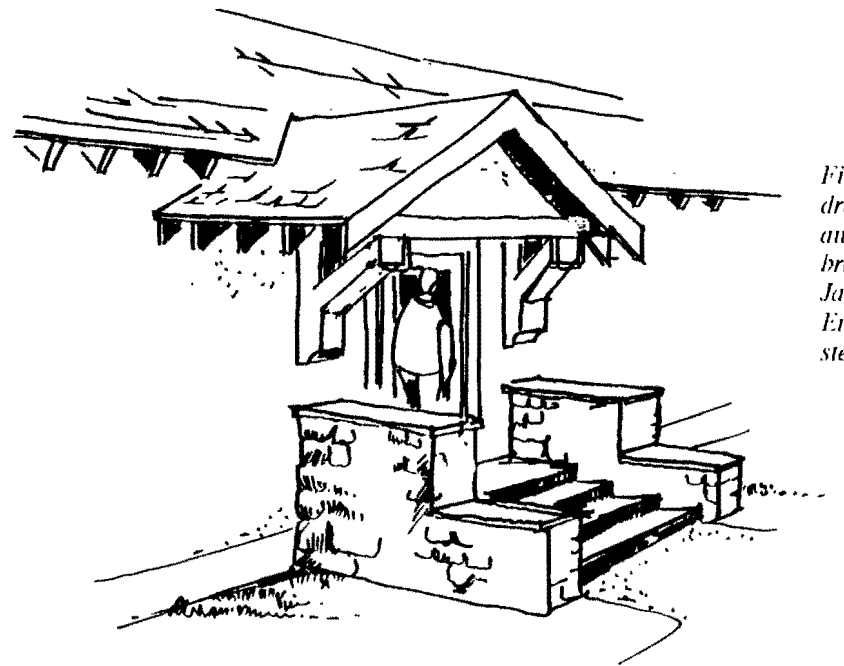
A dropped entry roof and large simple brackets are typical Jasper details. Entries often have stepped side walls.
